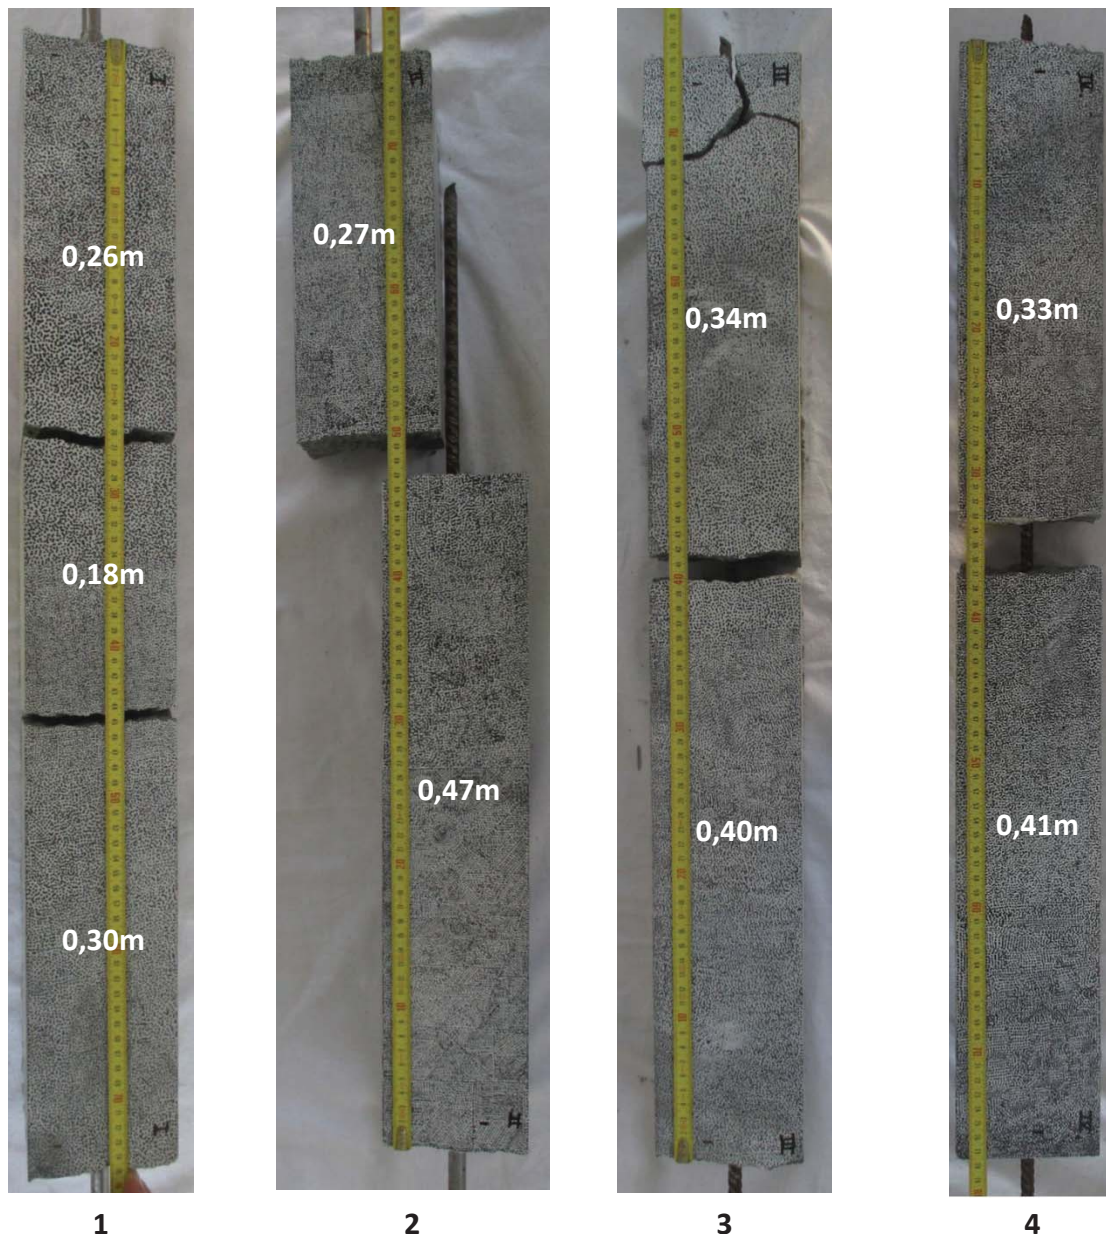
Side view of all four concrete strands after the test, facing the same way as during the test. Test specimen 1 and 2 developed no failures at the ends as the reinforcement had thickenings at the ends. The reinforcement ruptured inside the concrete. Test specimen 3 and 4 had no thickenings in the reinforcement and therefore they developed some failure at the ends. The reinforcement ruptured outside the concrete.
